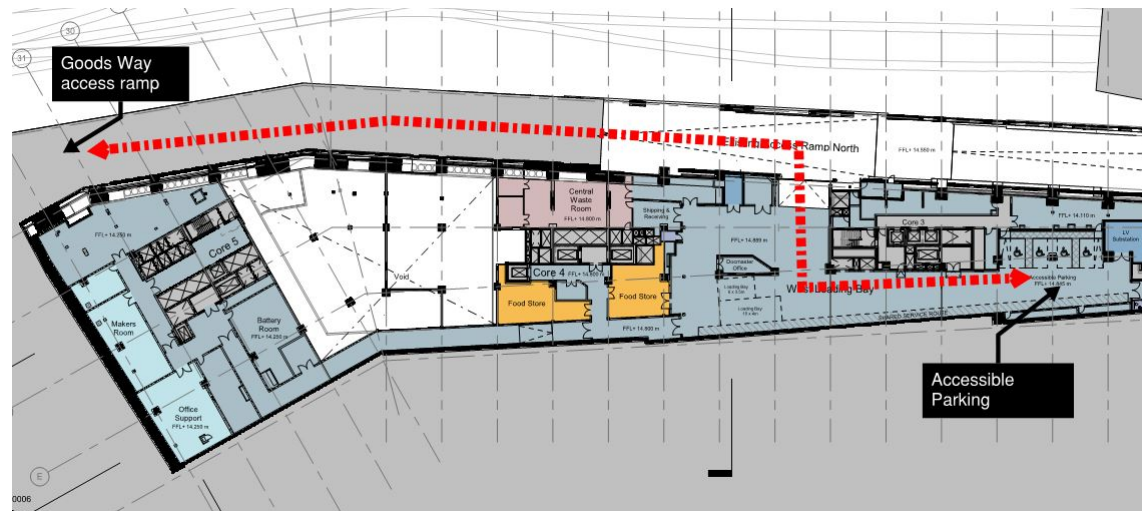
Upper basement plan showing location of 4 accessible parking spaces
